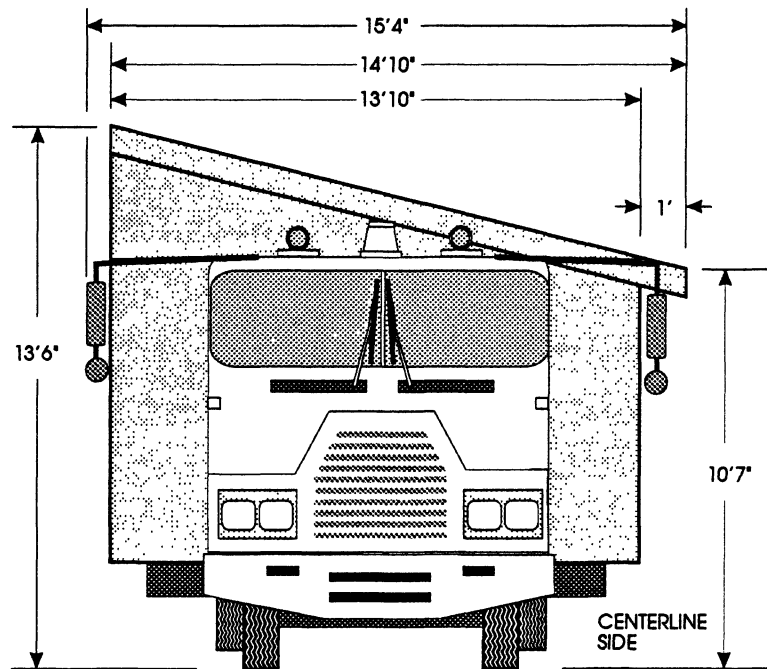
14 FEET WIDE W/EAVE ON CENTERLINE SIDE (CLE).
